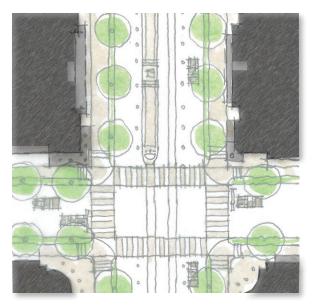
New Buildings should maintain a continuos frontage along streets and should address or open directly to the sidewalk.
